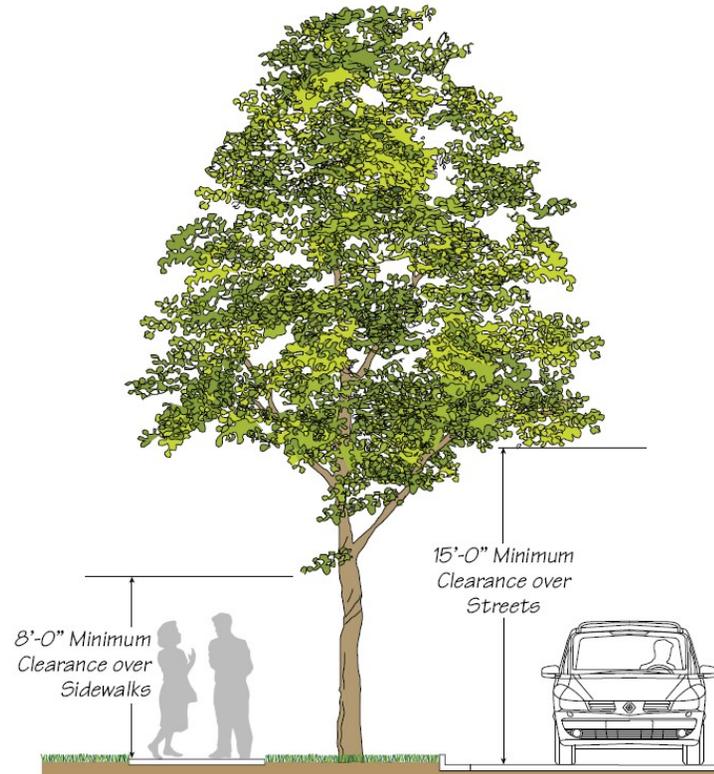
Trees shall be pruned to provide clearance over sidewalks and streets.
